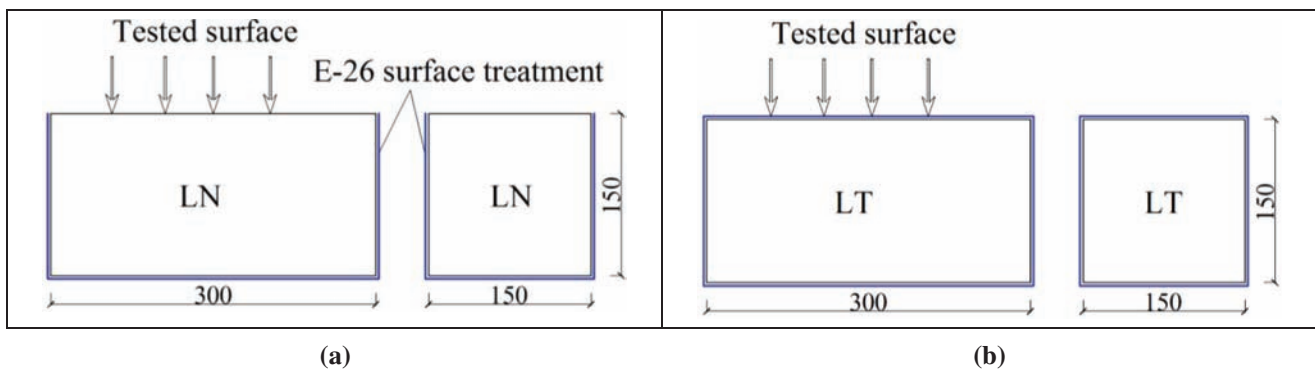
Layout details of concrete specimens (in millimeter). (a) Specimens LN treated except the top surface and (b) specimens LT treated on all the surfaces.
